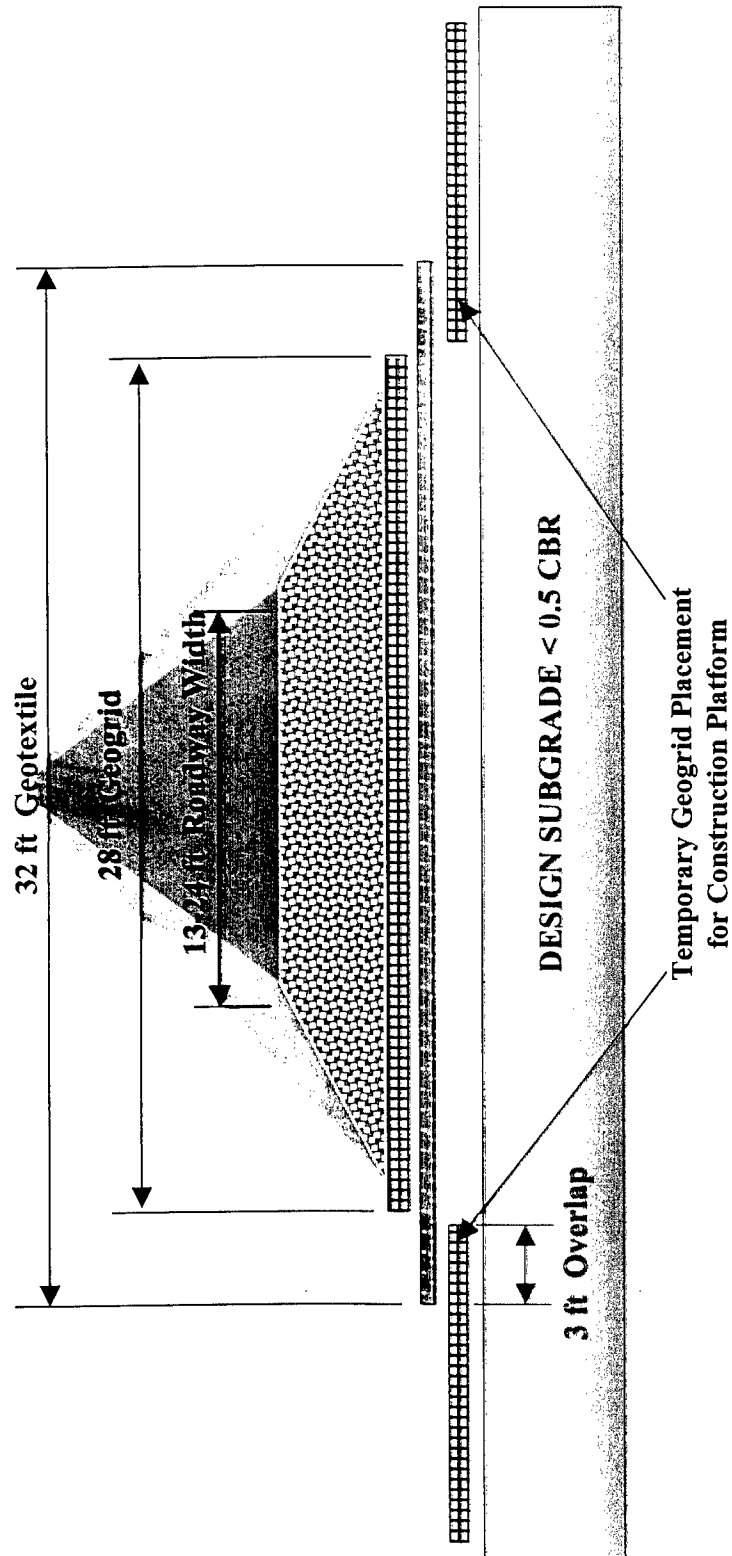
Typical cross section showing geogrid/geotextile placement for traffic Lane 1
